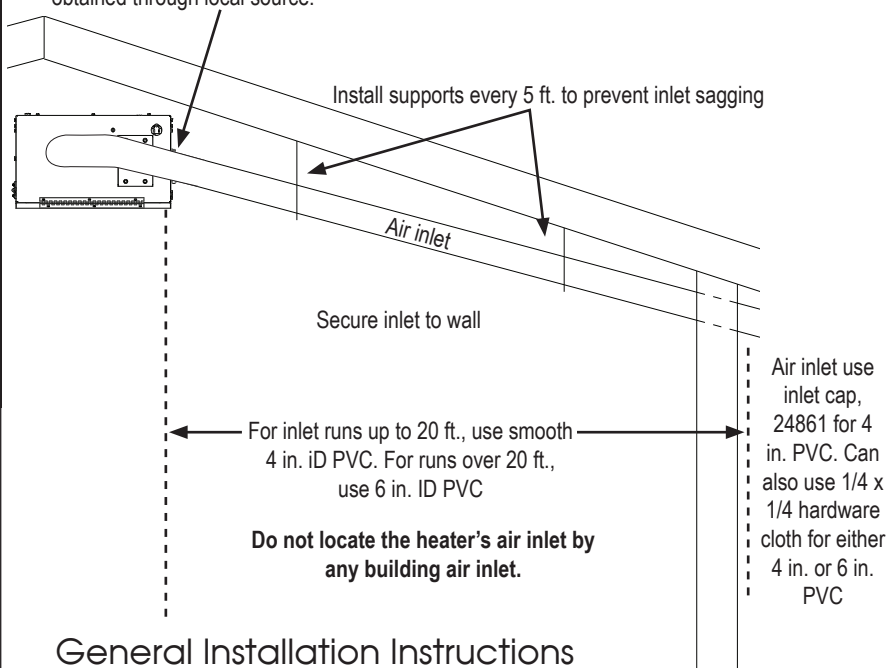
DRAWING INLET AIR THROUGH SIDEWALLS
